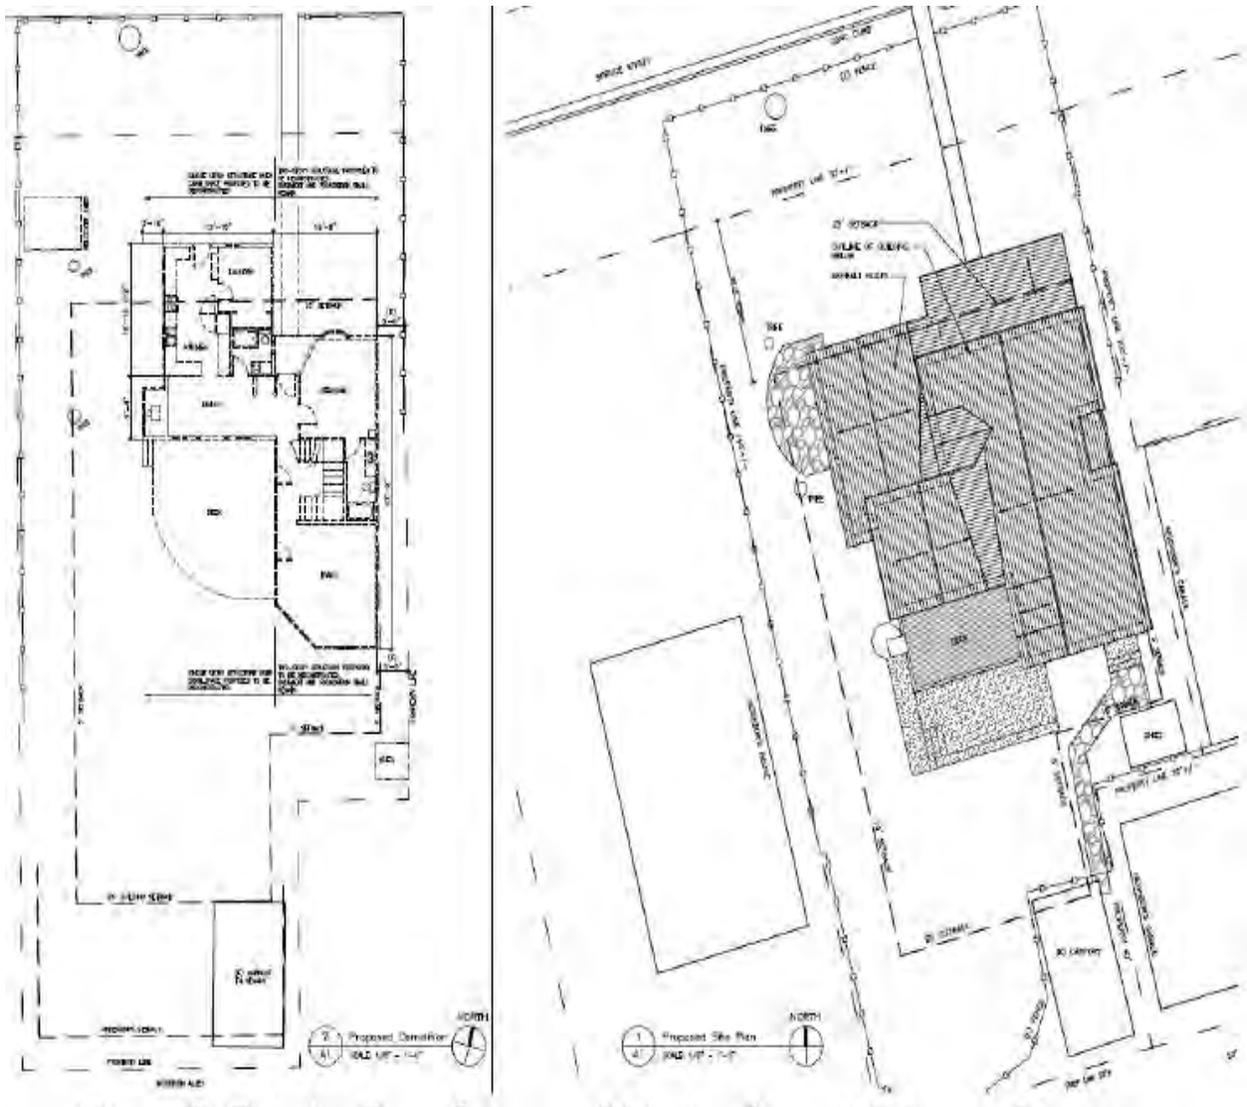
Existing (l) and proposed (r) site plans, 420 Spruce St.
